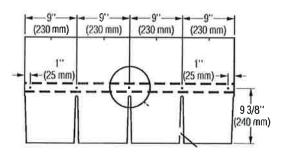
Fastening Hatteras Sbingles on Low and Standard Slopes
